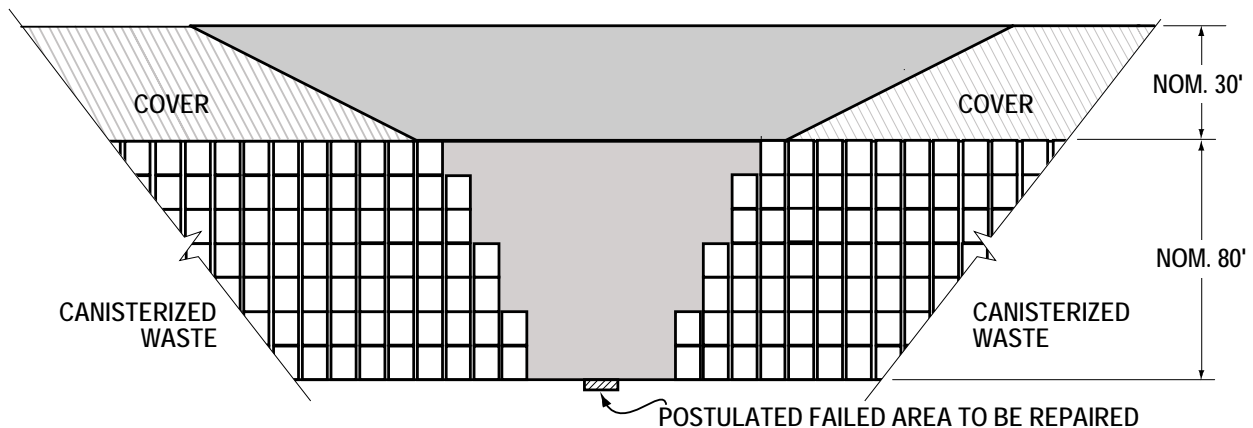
Depiction of Excavation Required to Repair Postulated Failed Area at Center of FWF-CDU
